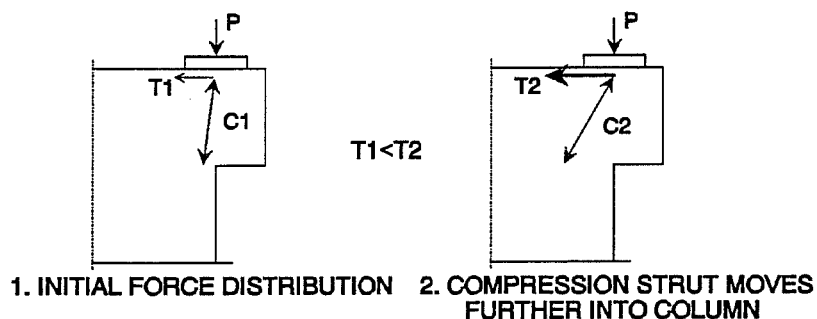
Redistribuition of Internal Forces in the Pier Cap
